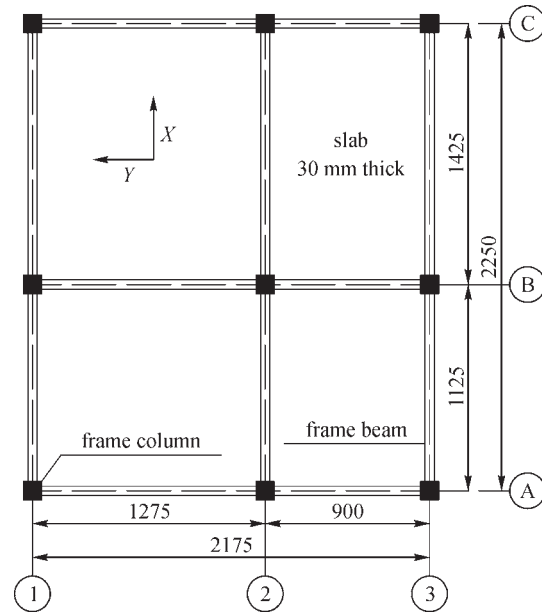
Plane layout of the cast-in situ RAC model (unit: mm)
